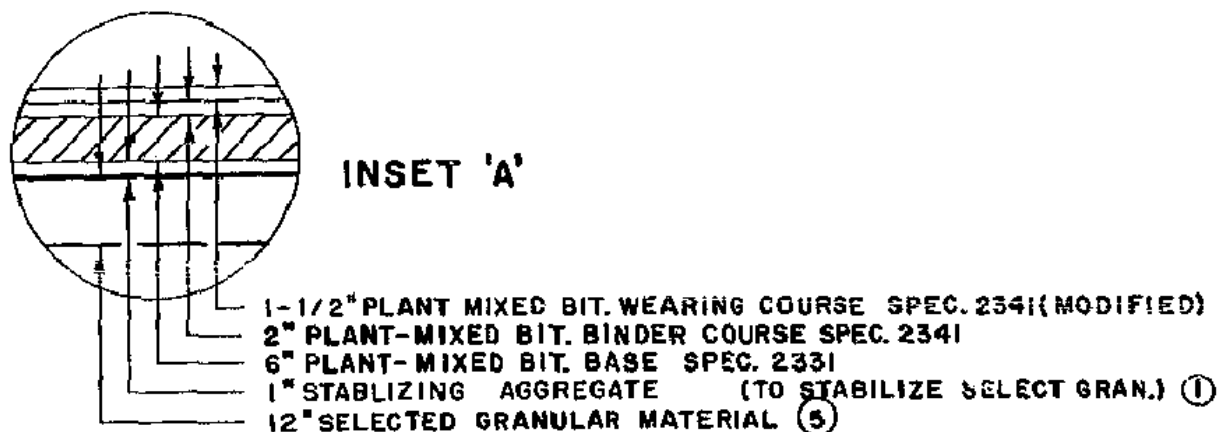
TH 10 mainline typical section (1973 construction plan)
